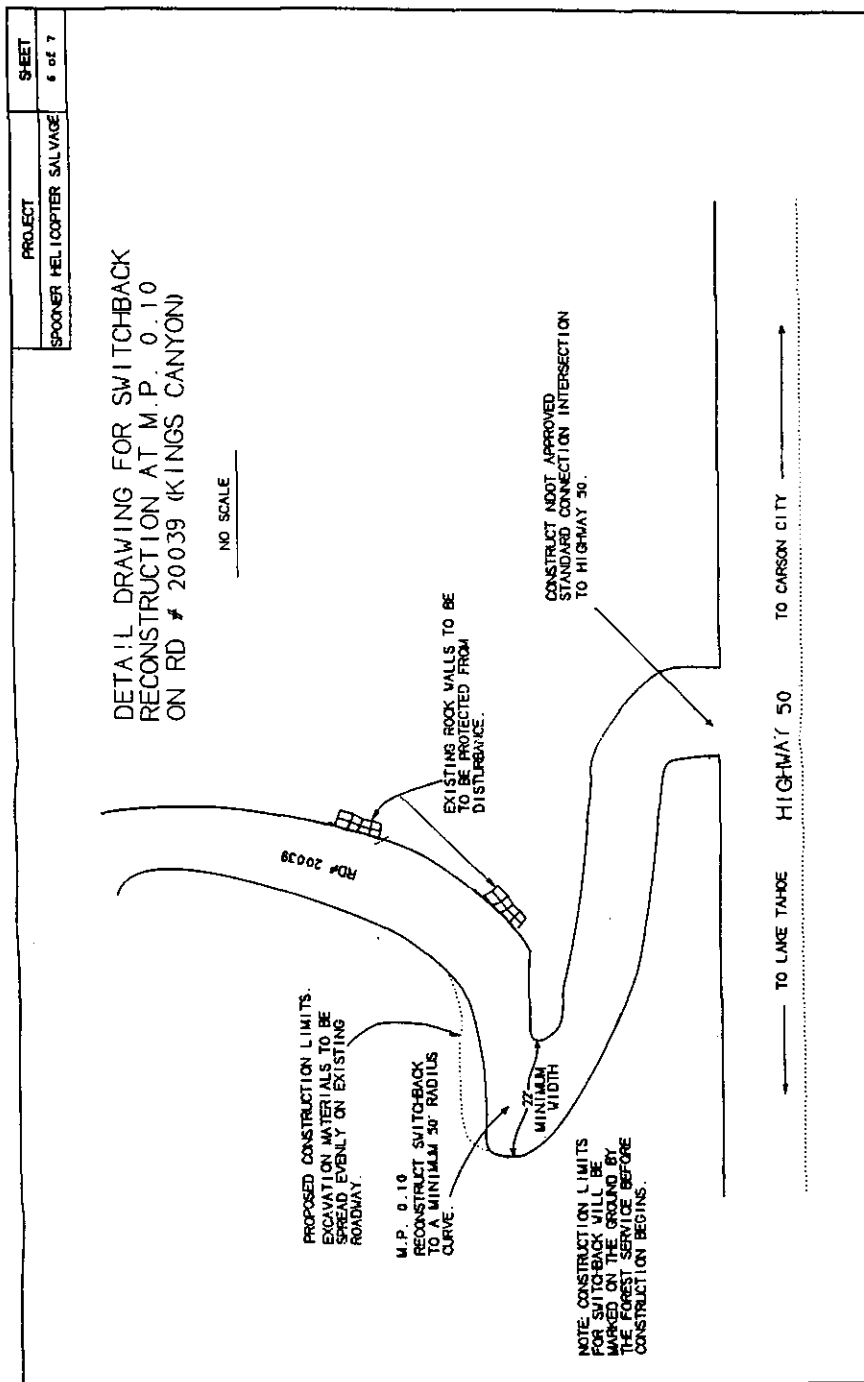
DRAWING OF THE PROPOSED ROAD TEMPLATE FOR RECONSTRUCTION ON
